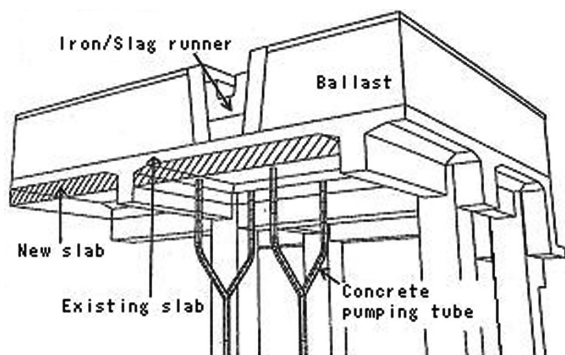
Cast house floor and reinforcement method by concrete casting from below
